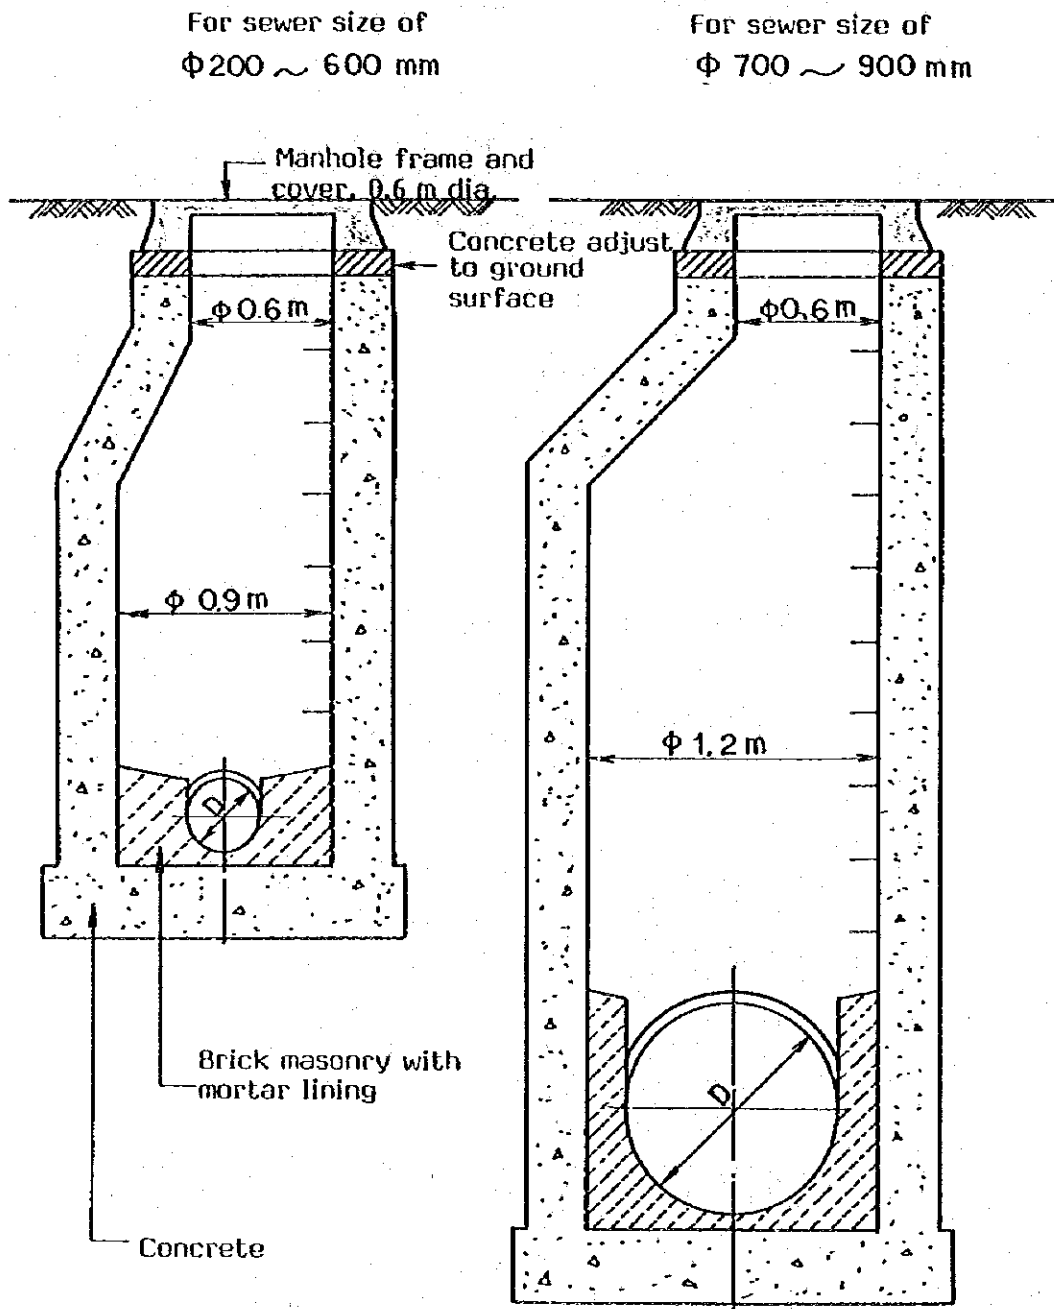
Typical Manhole for Non-Pressure Pipe
